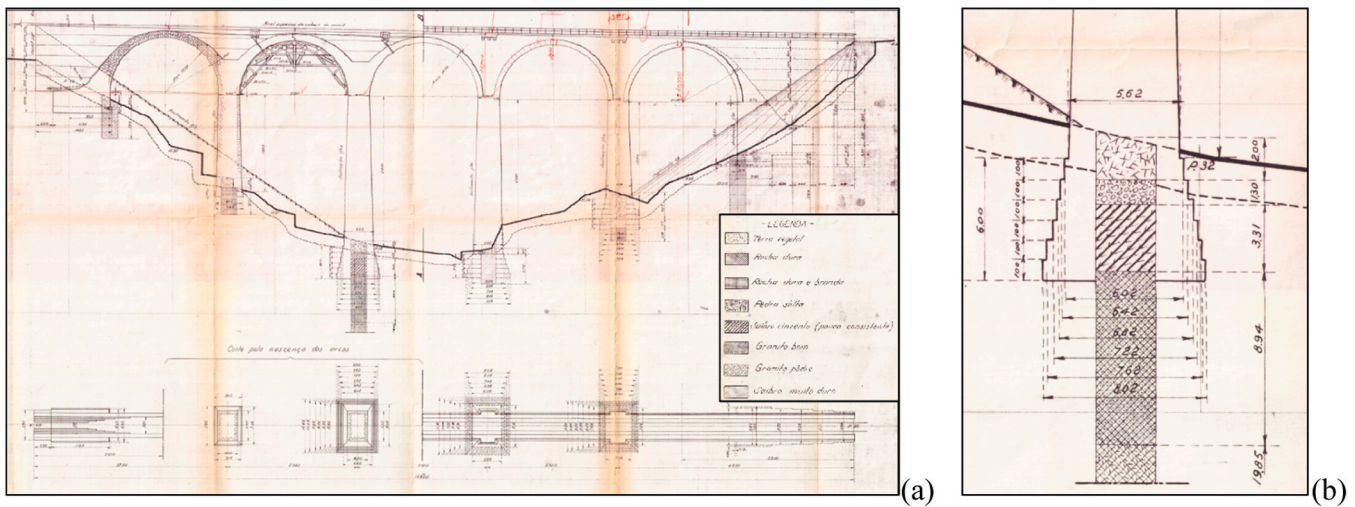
Original drawing provided by Portuguese infrastructure company; a) longitudinal section; b) detail of a pier foundation structure and soil.
